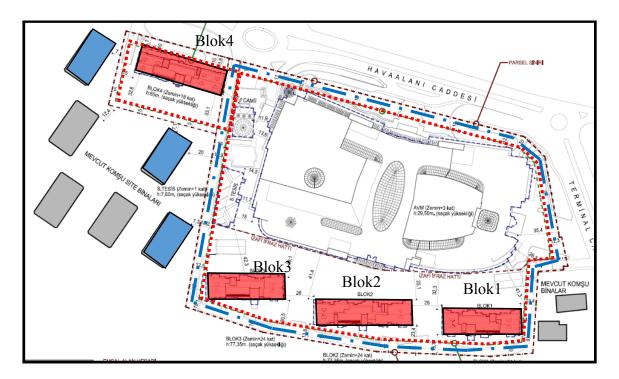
Architectural Layout Plan by MNG for parcels 7&8
